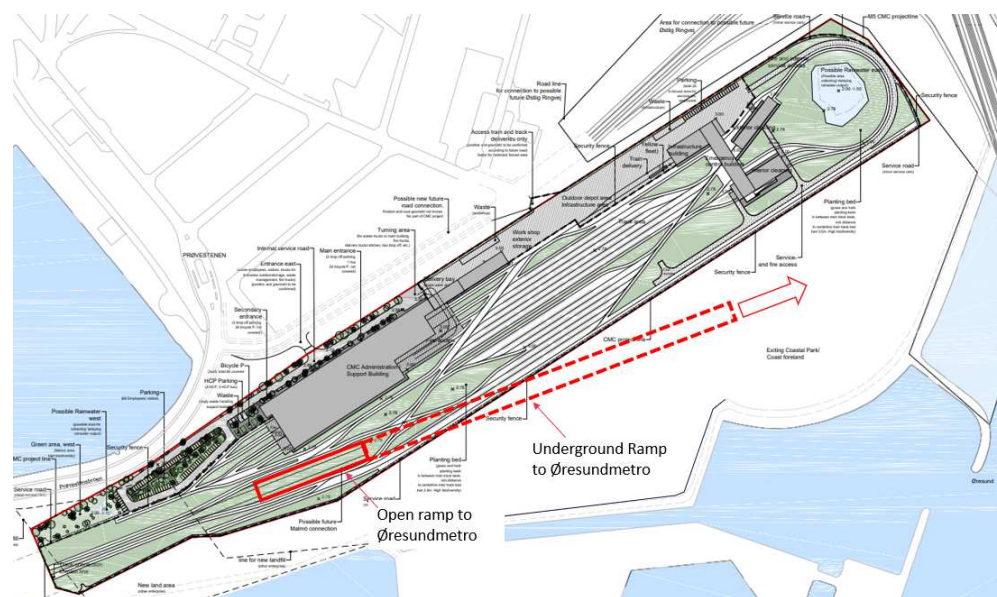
M5 CMC and Øresund metro Ramp (Storm surge embankment not shown).
